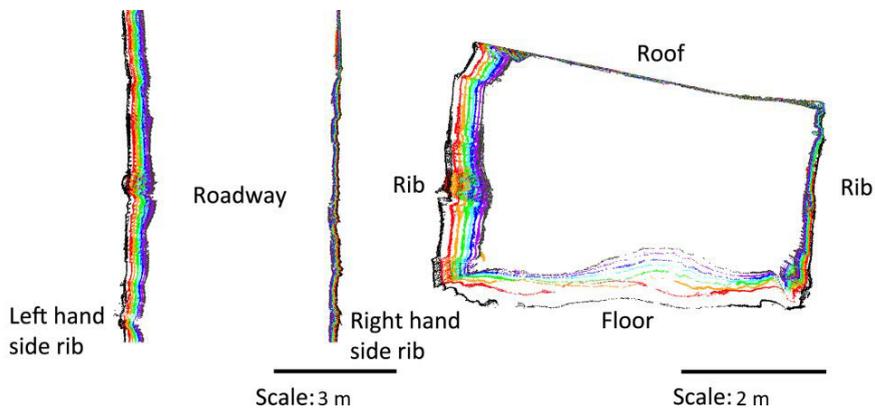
Plan view of roadway and cross-sections at position 2, roadway V300501.
